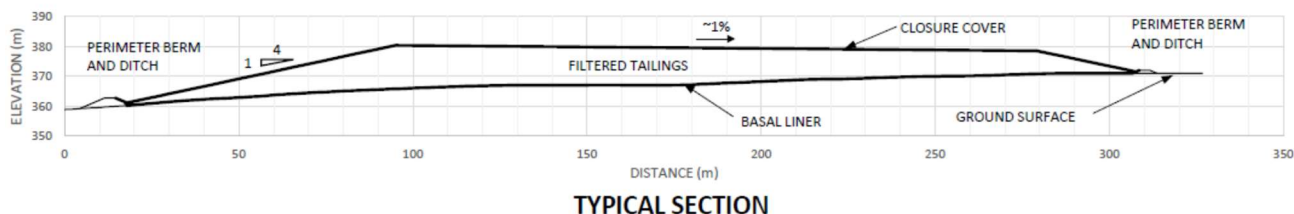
Longitudinal Section Through The Tailings Management Facility
